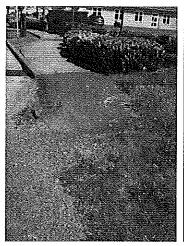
Ideal road shoulder used by pedestrians where bollards, curbs, and/or street reflectors could be installed.
